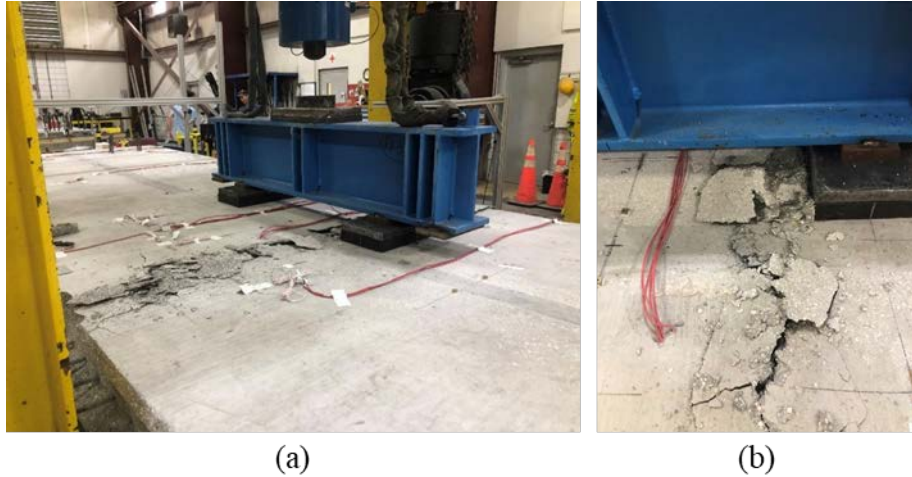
Crushing of FIU-1/2 concrete at failure for LC 2-1: (a) overview and (b) joint
